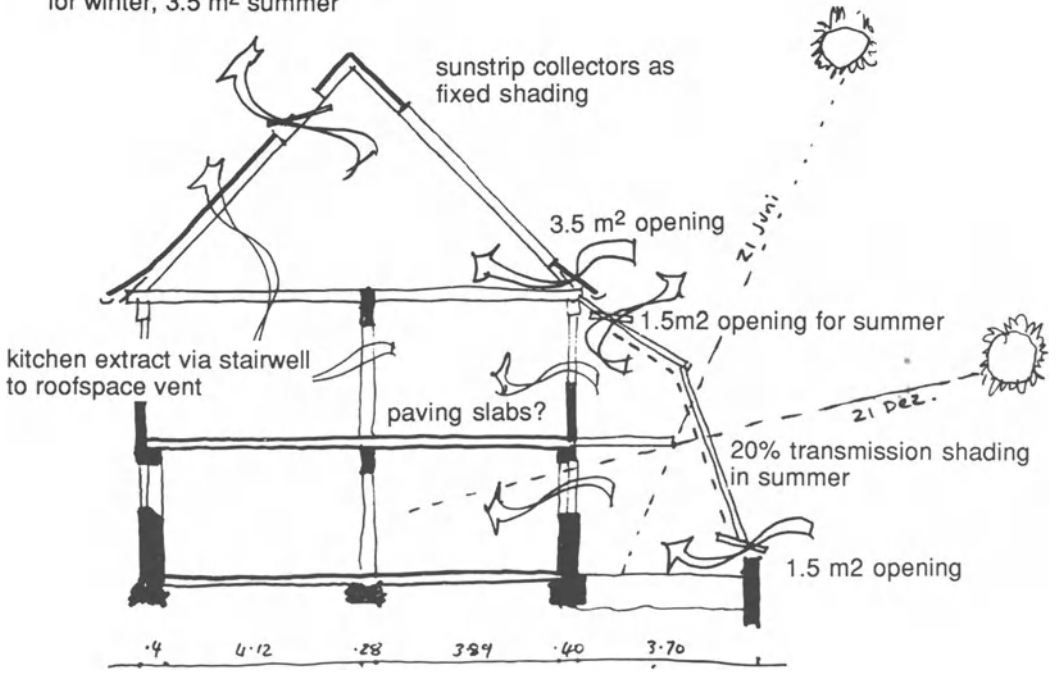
Section showing Lebensgarten greenhouse and seminar room
